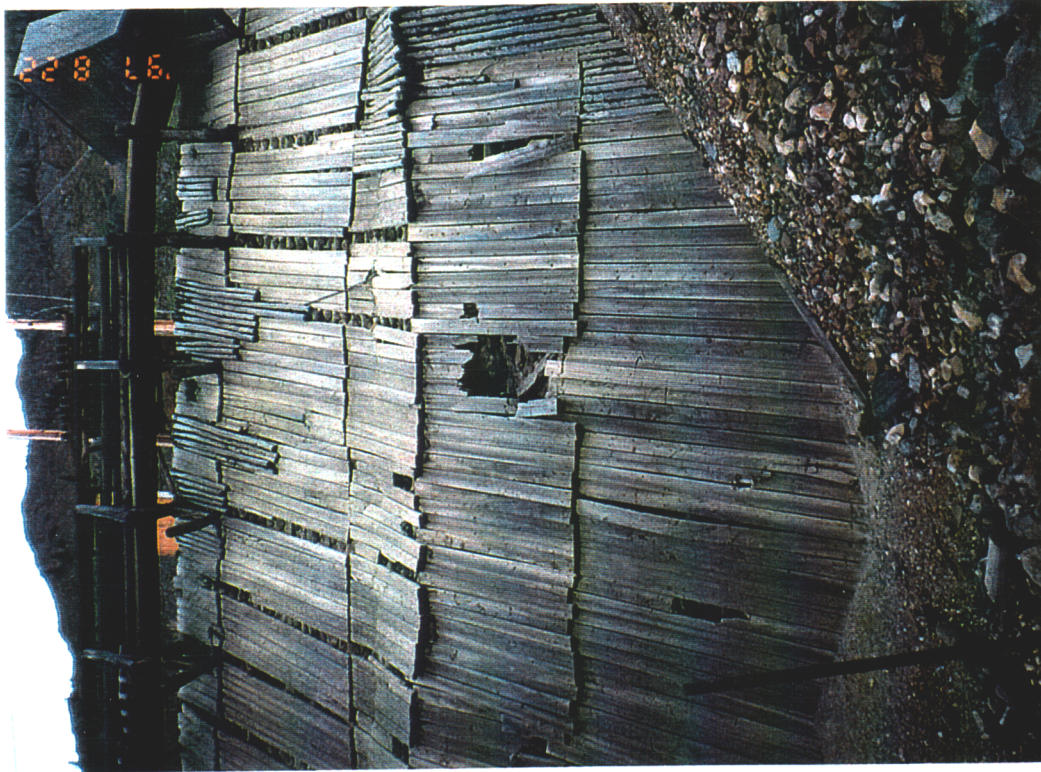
Looking west at log cribbing retaining structure. Note log cribbing construction; note shack fallen over at top right;
